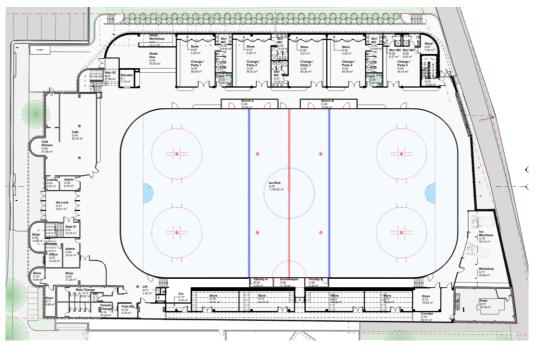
Proposed development Site: Canterbury Ice Rink- Ground Floor
